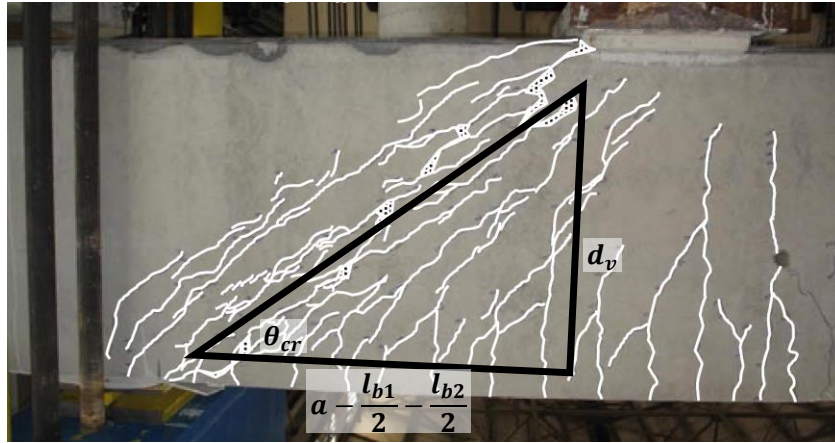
Crack inclination limit based on geometry (Adapted from Birrcher et al., 2009)
